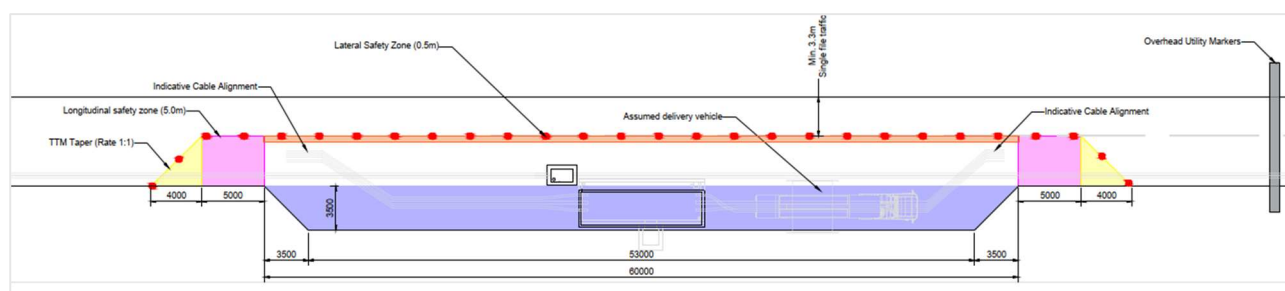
Proposed Traffic Management and Construction Platform Arrangement for a Joint Bay in the Road Verge (Indicative Layout)
